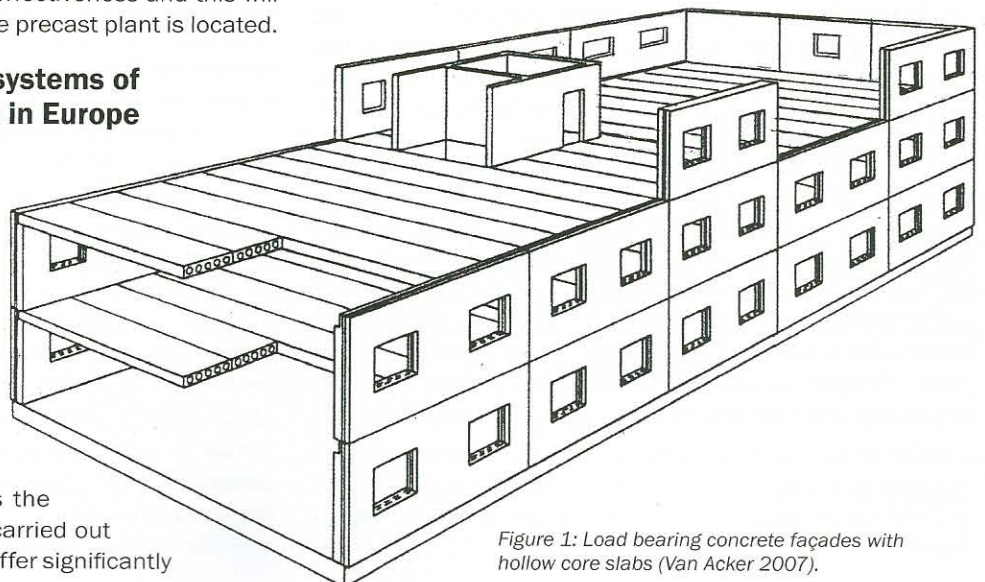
Load bearing concrete façades with hollow core slabs (Van Acker 2007).
